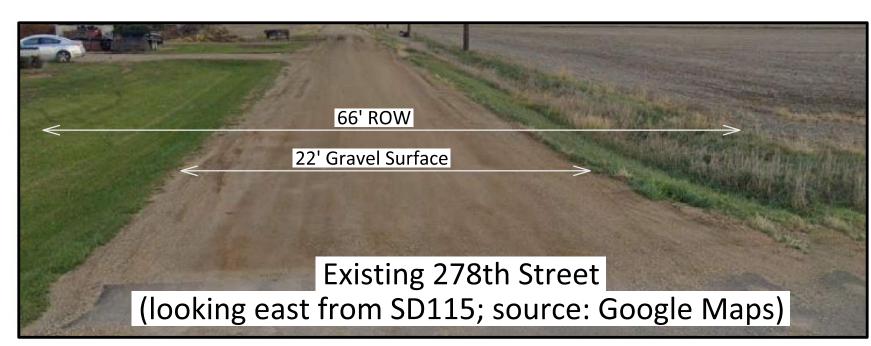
FIGURE DESCRIPTION: Pave 278th Street from Correctional Facility Site to Highway 11
